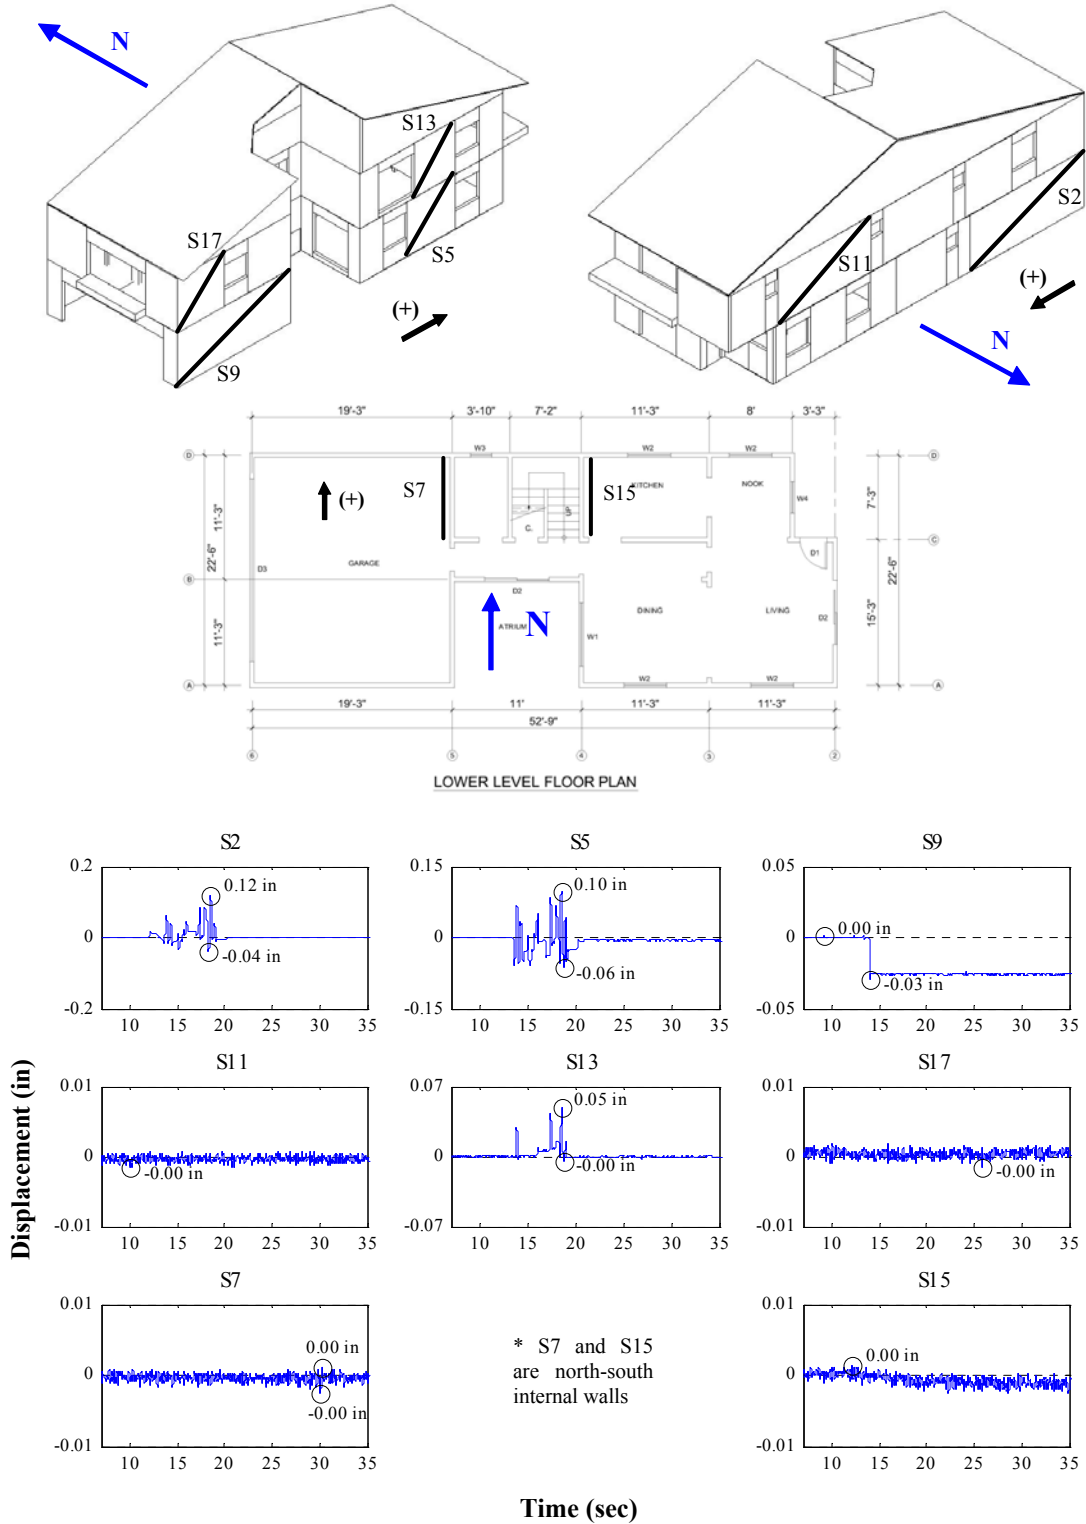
Wall deformations of east-west internal walls for Test NWP2S25
